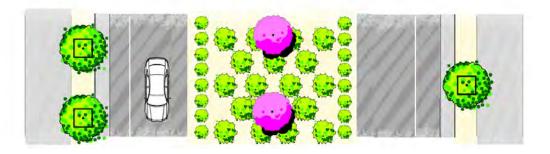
New Placerville Road Transit Corridor (Collector-Street Section Q)
